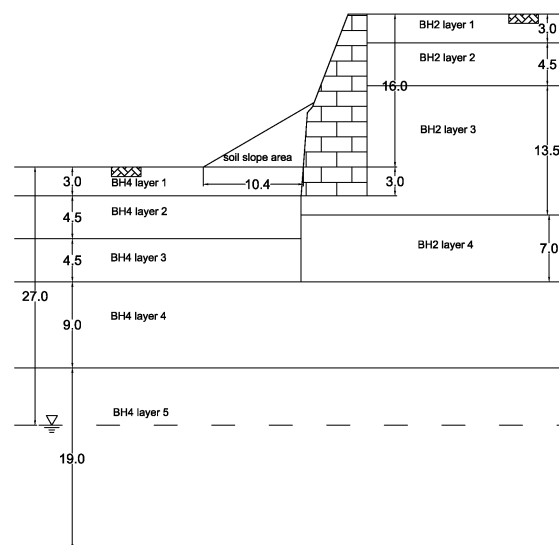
Section details and the depth of wall embedment (*all dimensions are in meter*)
